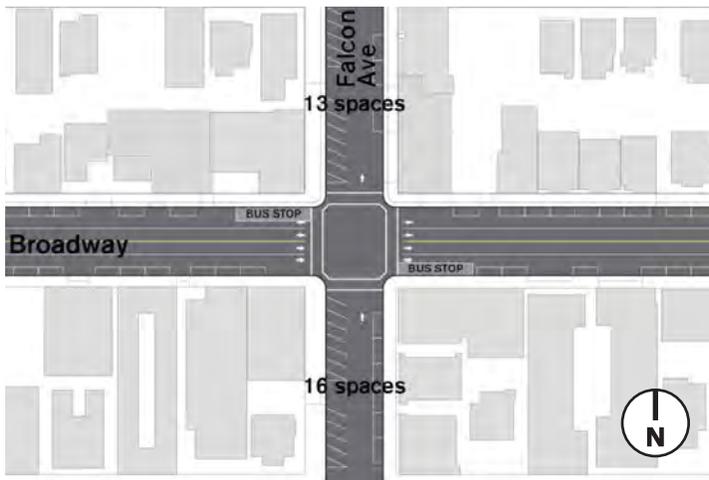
Broadway at Falcon Intersection: Existing (85 parking spaces)
